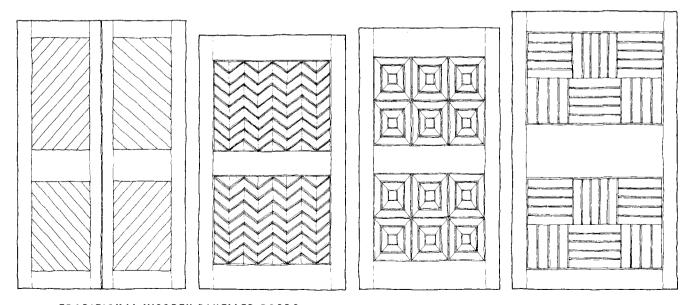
TRADITIONAL WOODEN PANELLED DOORS - FROM DOCUMENTATION OF GHANA BUILDINGS THE DOORS ARE NOT TRUE PANELLED DOORS BUT RATHER FRAMED AND BOARDED DOORS WITH PANELLING PIECES FIXED OVER THE VERTICAL BOARDING. THICKNESS OF STILES AND RAILS ABOUT 30 mm , PANELLING BOARDS ARE 12 TO 15mm THICK.TIMBER USED : TERMINALIA SUPERBA (OFRAM).
